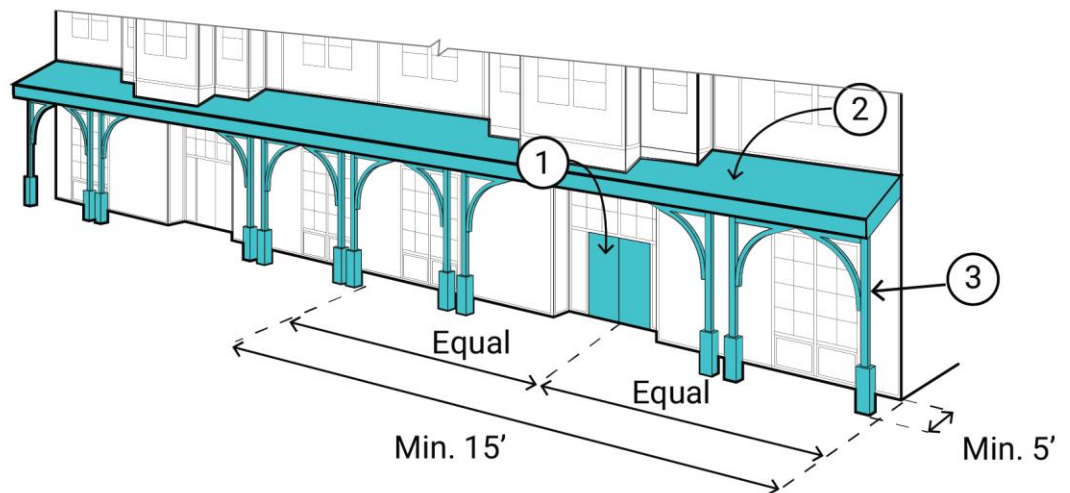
(B)(4)(b)(ii): Covered walkways or overhangs, certain streets — VMU District
